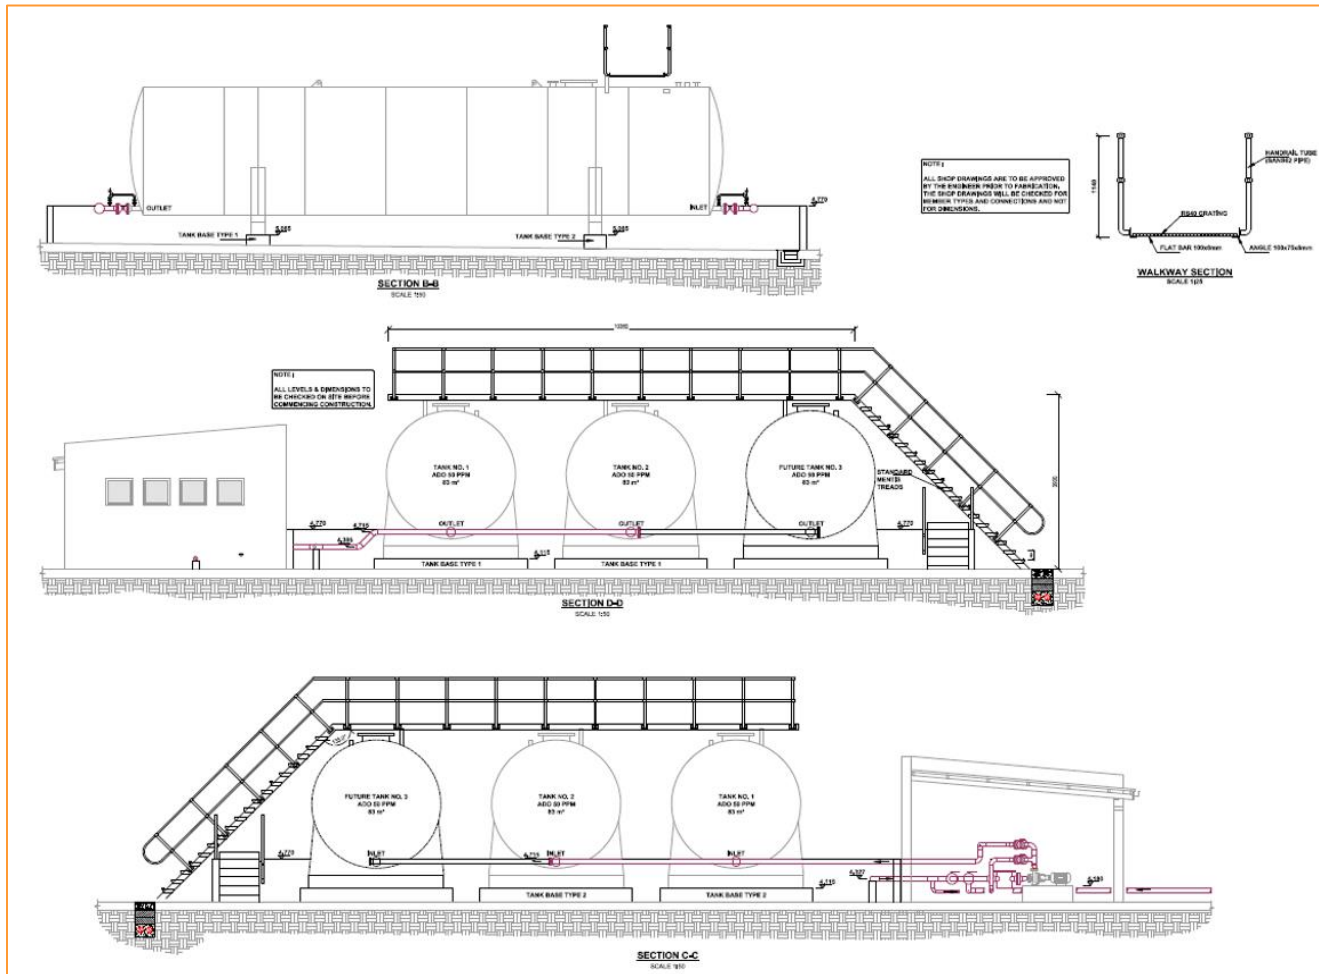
Illustration of the mechanical / tank stair and walkway layout of the proposed facility
